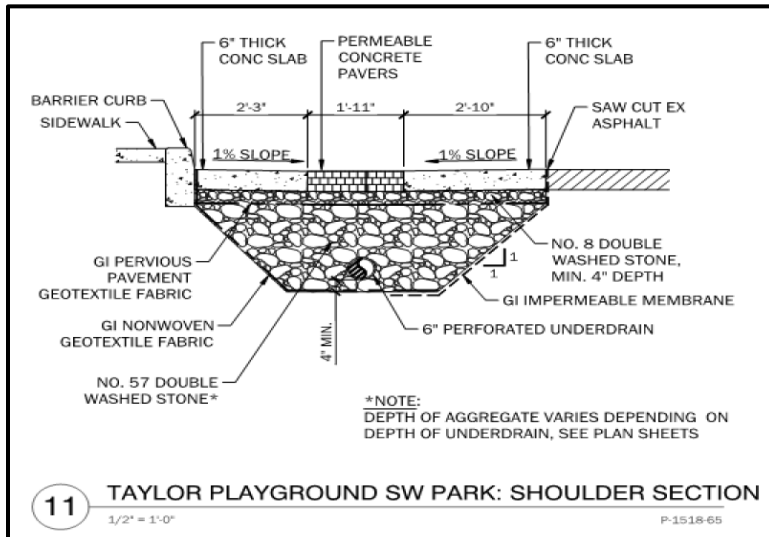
Typical Cross Section of Proposed Shoulder Section at Taylor Park
